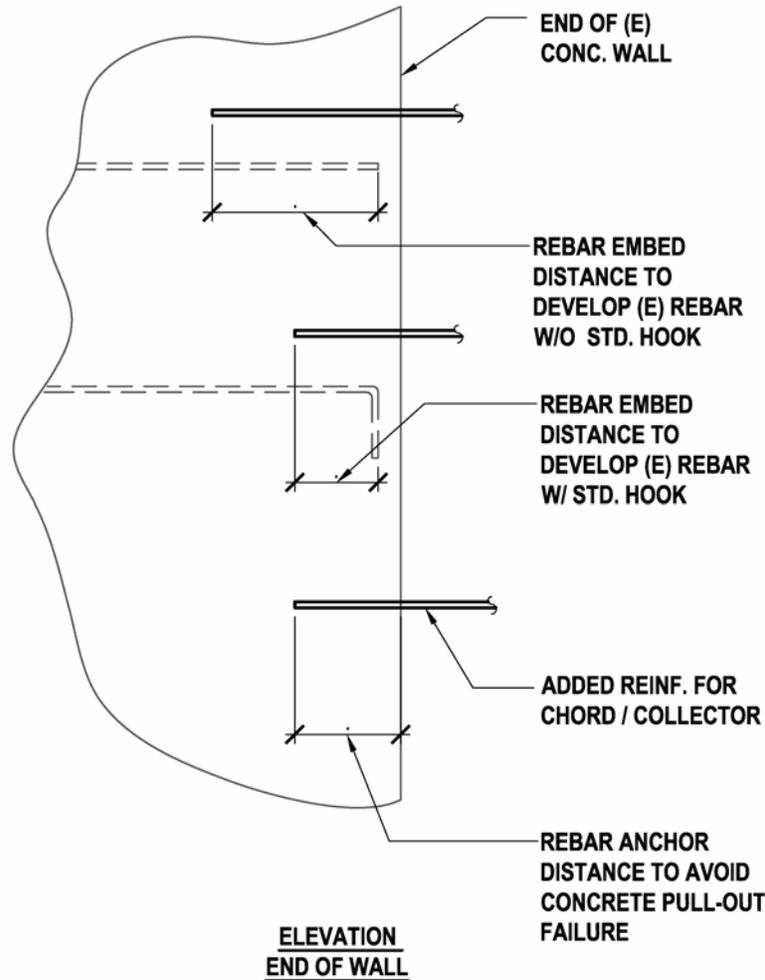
Rebar Embedment Considerations in Collector Anchorage to Existing Shear Wall
